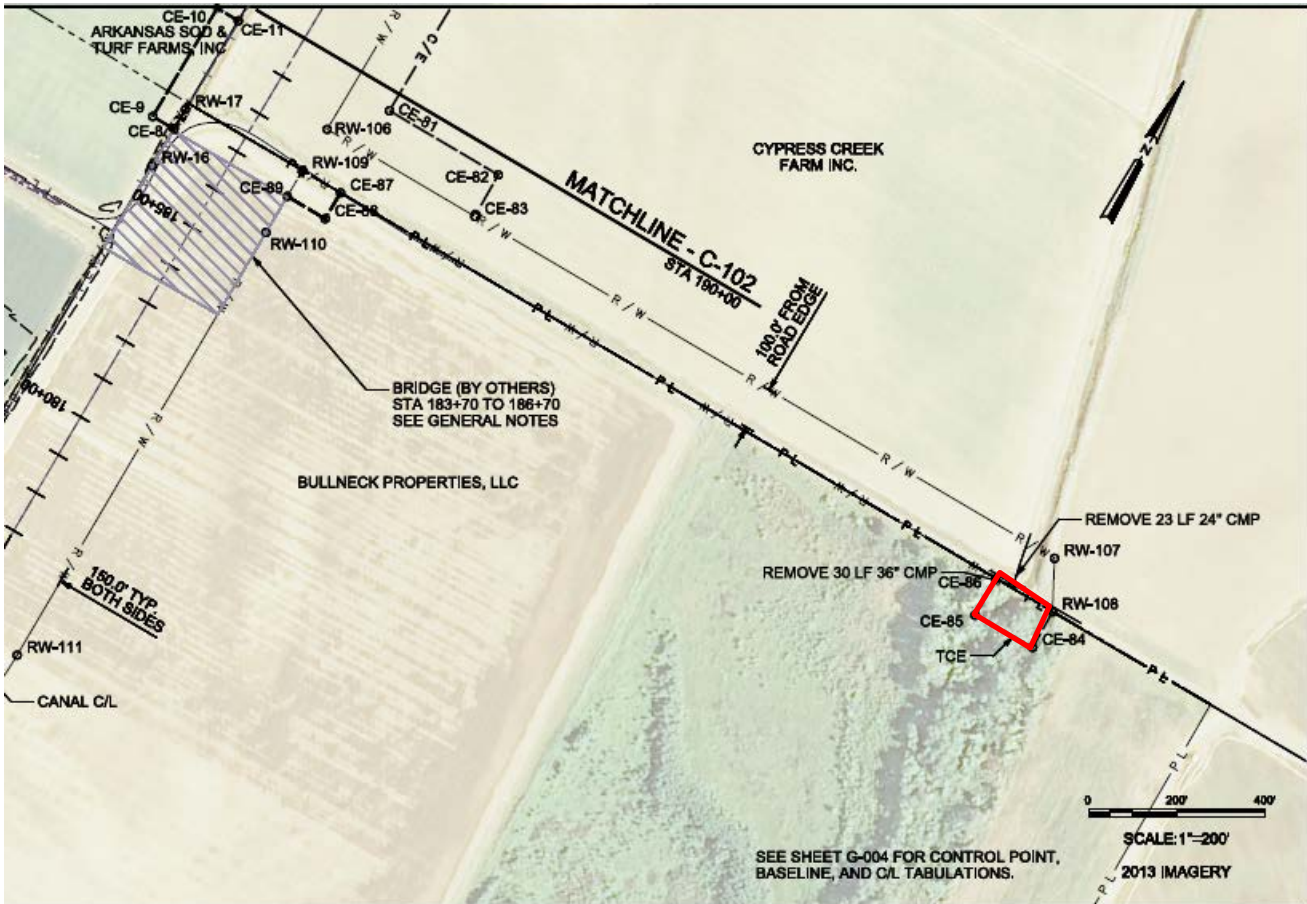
Location of the proposed temporary construction easement for a culvert replacement on the south side of Scott Road, near Scott, Arkansas. Vegetation would regrow once construction was completed.
